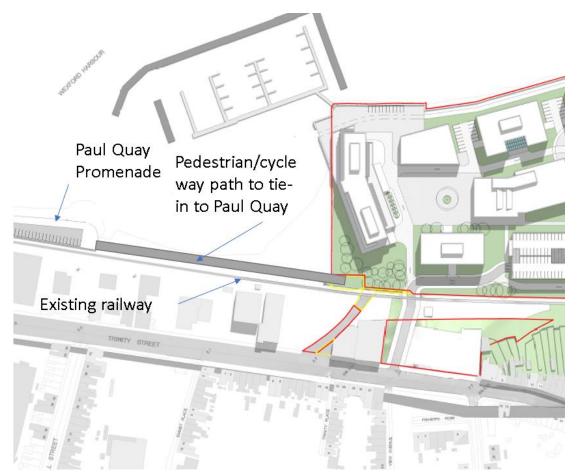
Pedestrian access alongside railway (Note: the site layout in this plate is taken from the conceptual design stage and contains elements including the site boundaries, have been updated as part of the final design)
